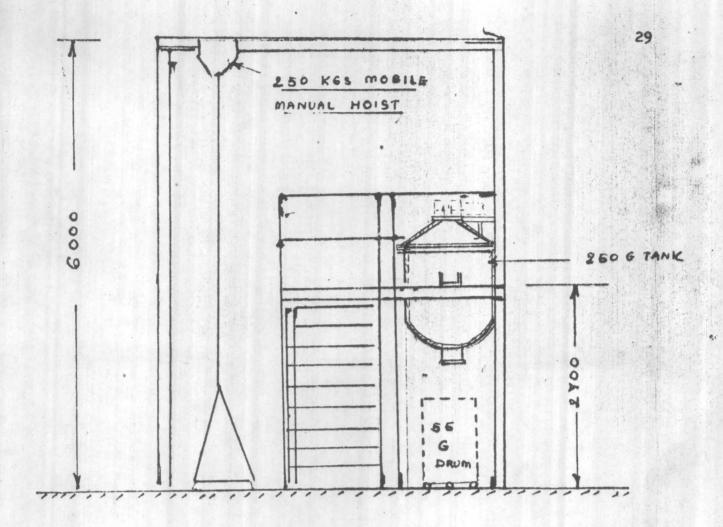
Front elevation Proposed stillage and hoist runaway system for 250 G. stirred tank
